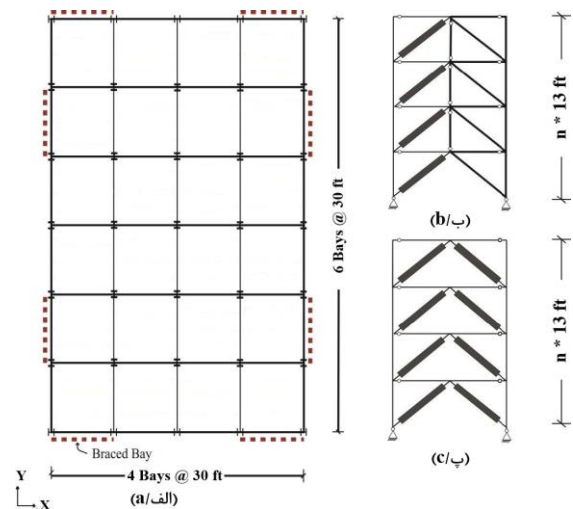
(a) Building plan view, and elevations of a braced bay in (b) RBRBF and (c) BRBF systems
